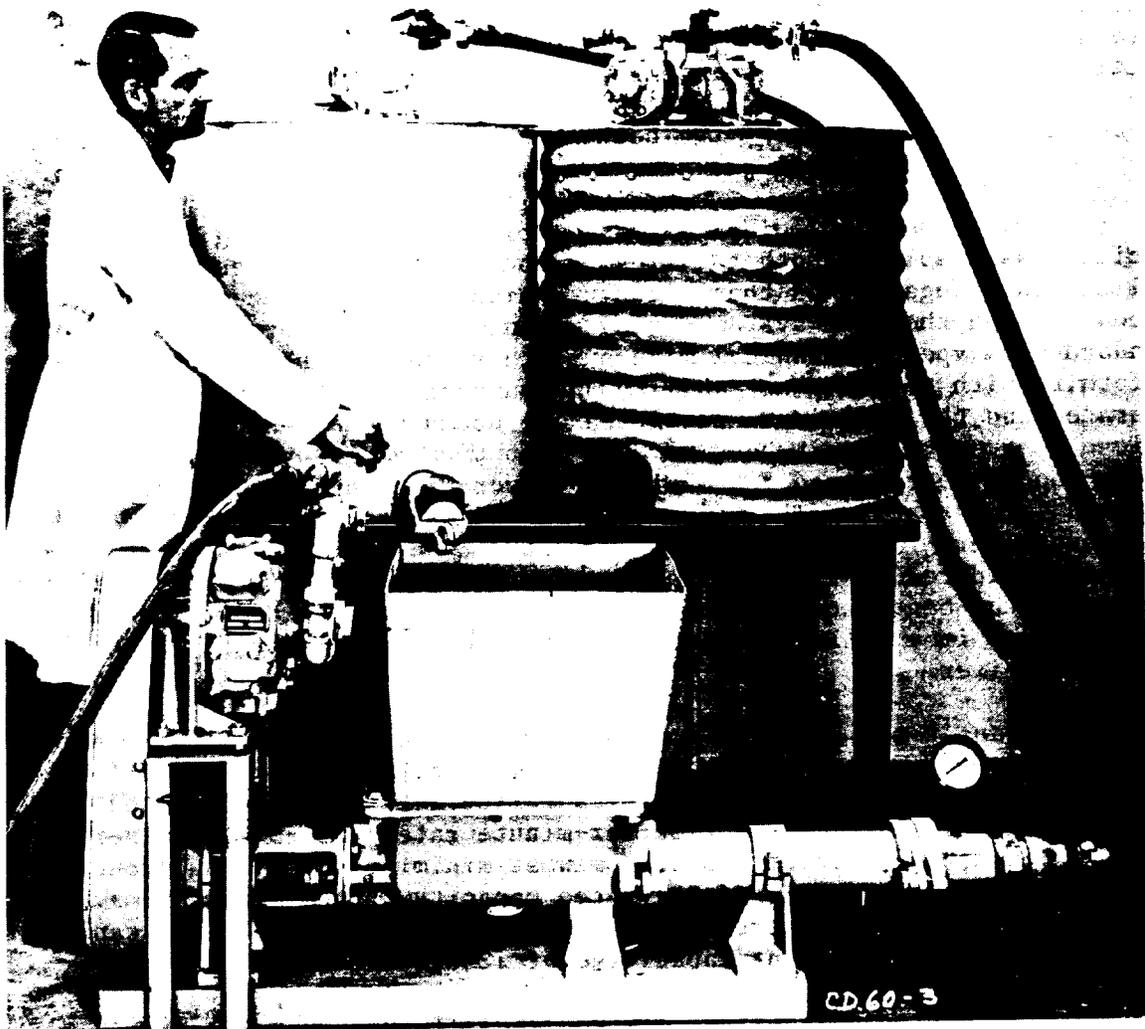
Two tub-type grout mixers and open throat progressing cavity pump
